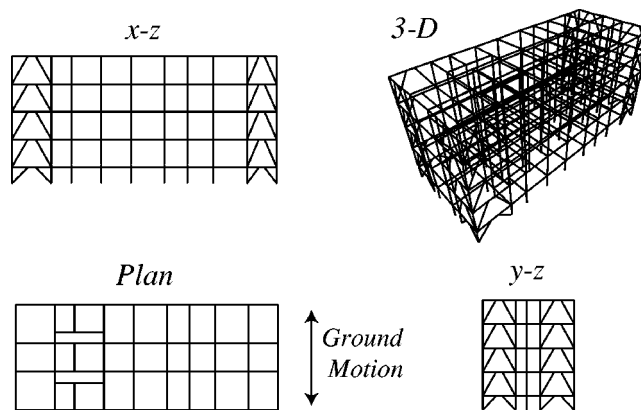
Plan, elevation, and isometric views of the apartment building showing the direction of ground motion considered in this study. The building is shown here with the bracing retrofit.
